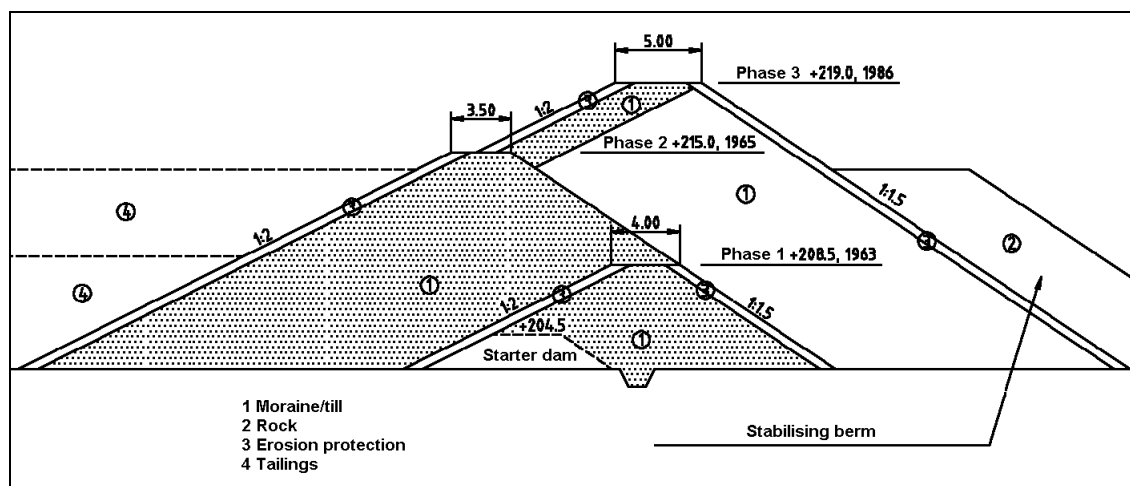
Cross-section of dam at Garpenberg before latest raise
